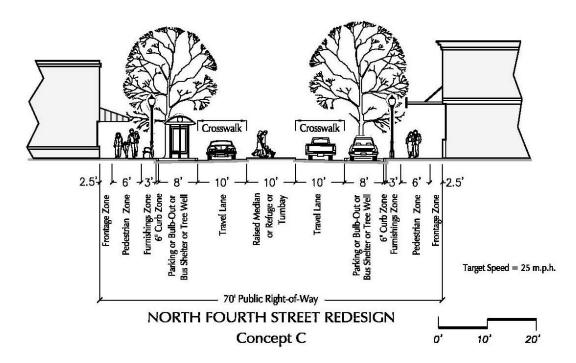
REDESIGN CONCEPT C BETWEEN I-40 AND MOUNTAIN ROAD
